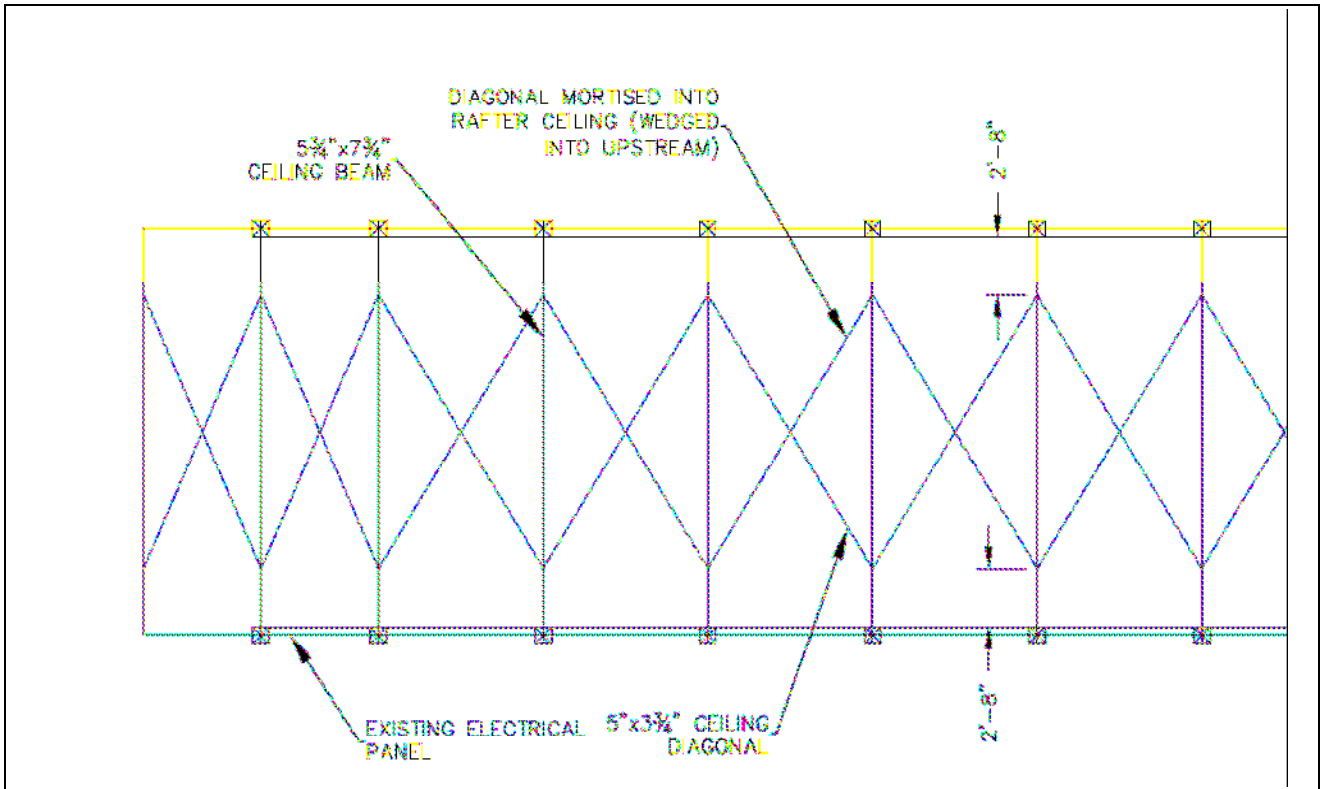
Upper cross (tie) beams and diagonal lateral bracing, plan of existing conditions (source: HEB 2012)
